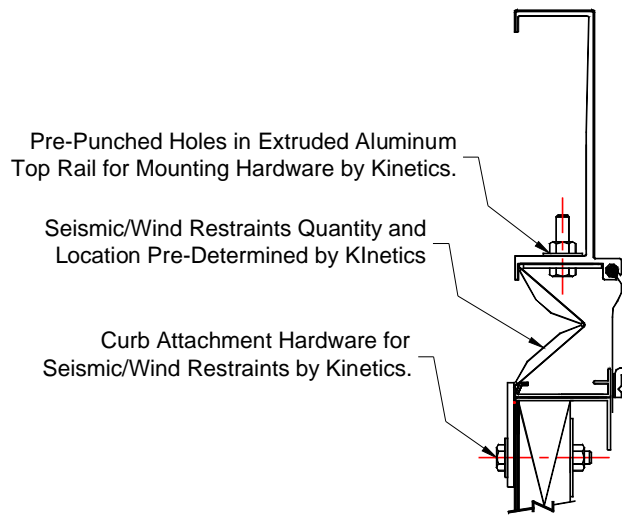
; Typical Cross-Section Through KSR Showing Restraints.
